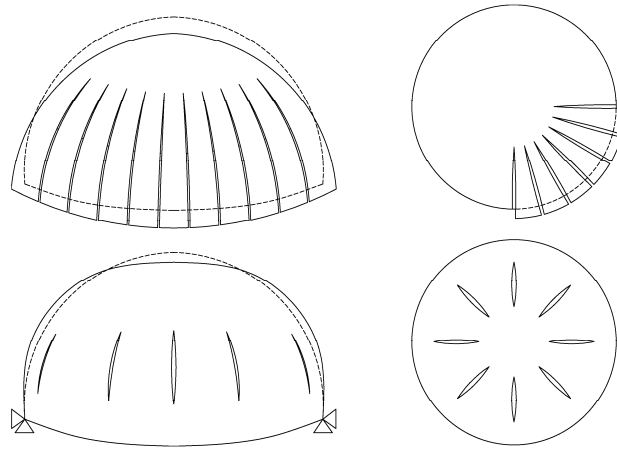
(Top) Spherical masonry domes without hoop tension carrying mechanism: aerial and plan view of cracks (reproduced with permission, (Heyman, 1995)); (Bottom) Spherical masonry domes with a tension ring: aerial and plan view of cracks.
